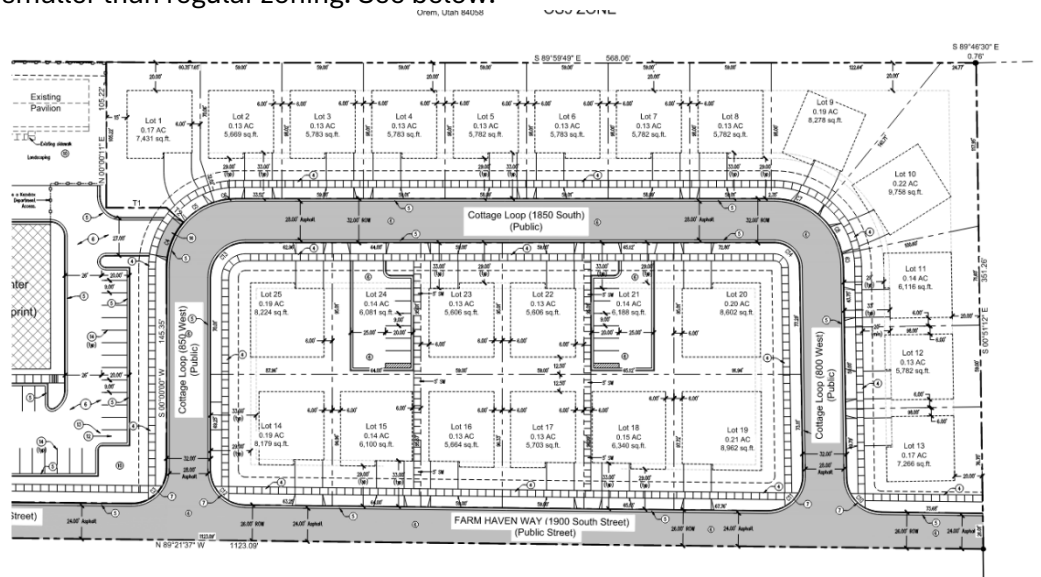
Existing Site Plan, Farm Haven (cottage lots)
